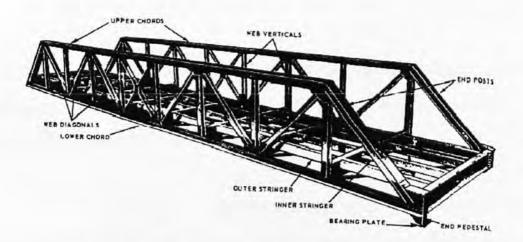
Example of structural element of steel truss bridge - Through type steel truss bridge
